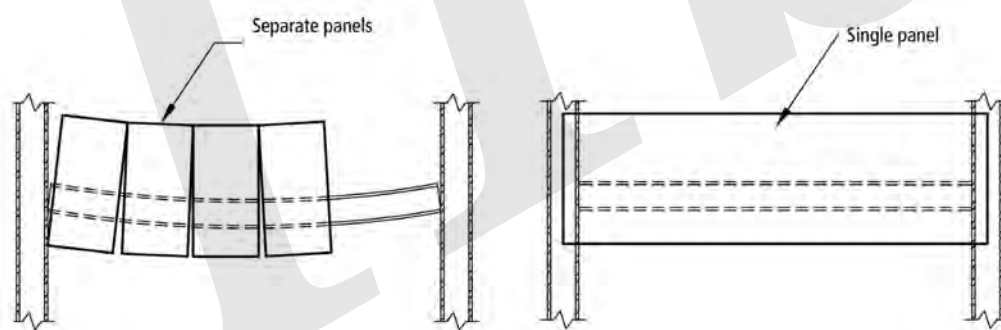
Deflected position of supporting member due to weight of panels.
